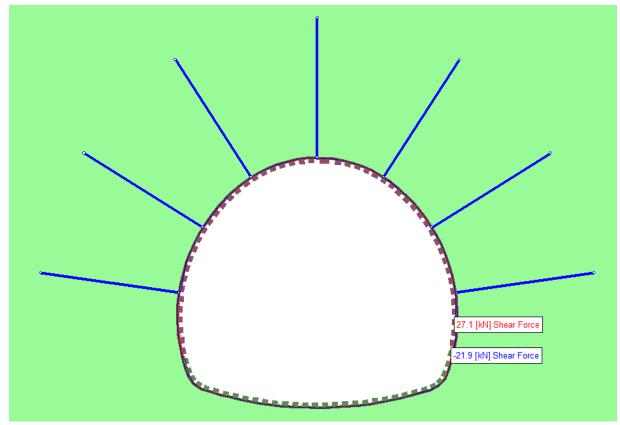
Liner shear force (Q) of the ventilation tunnel.
